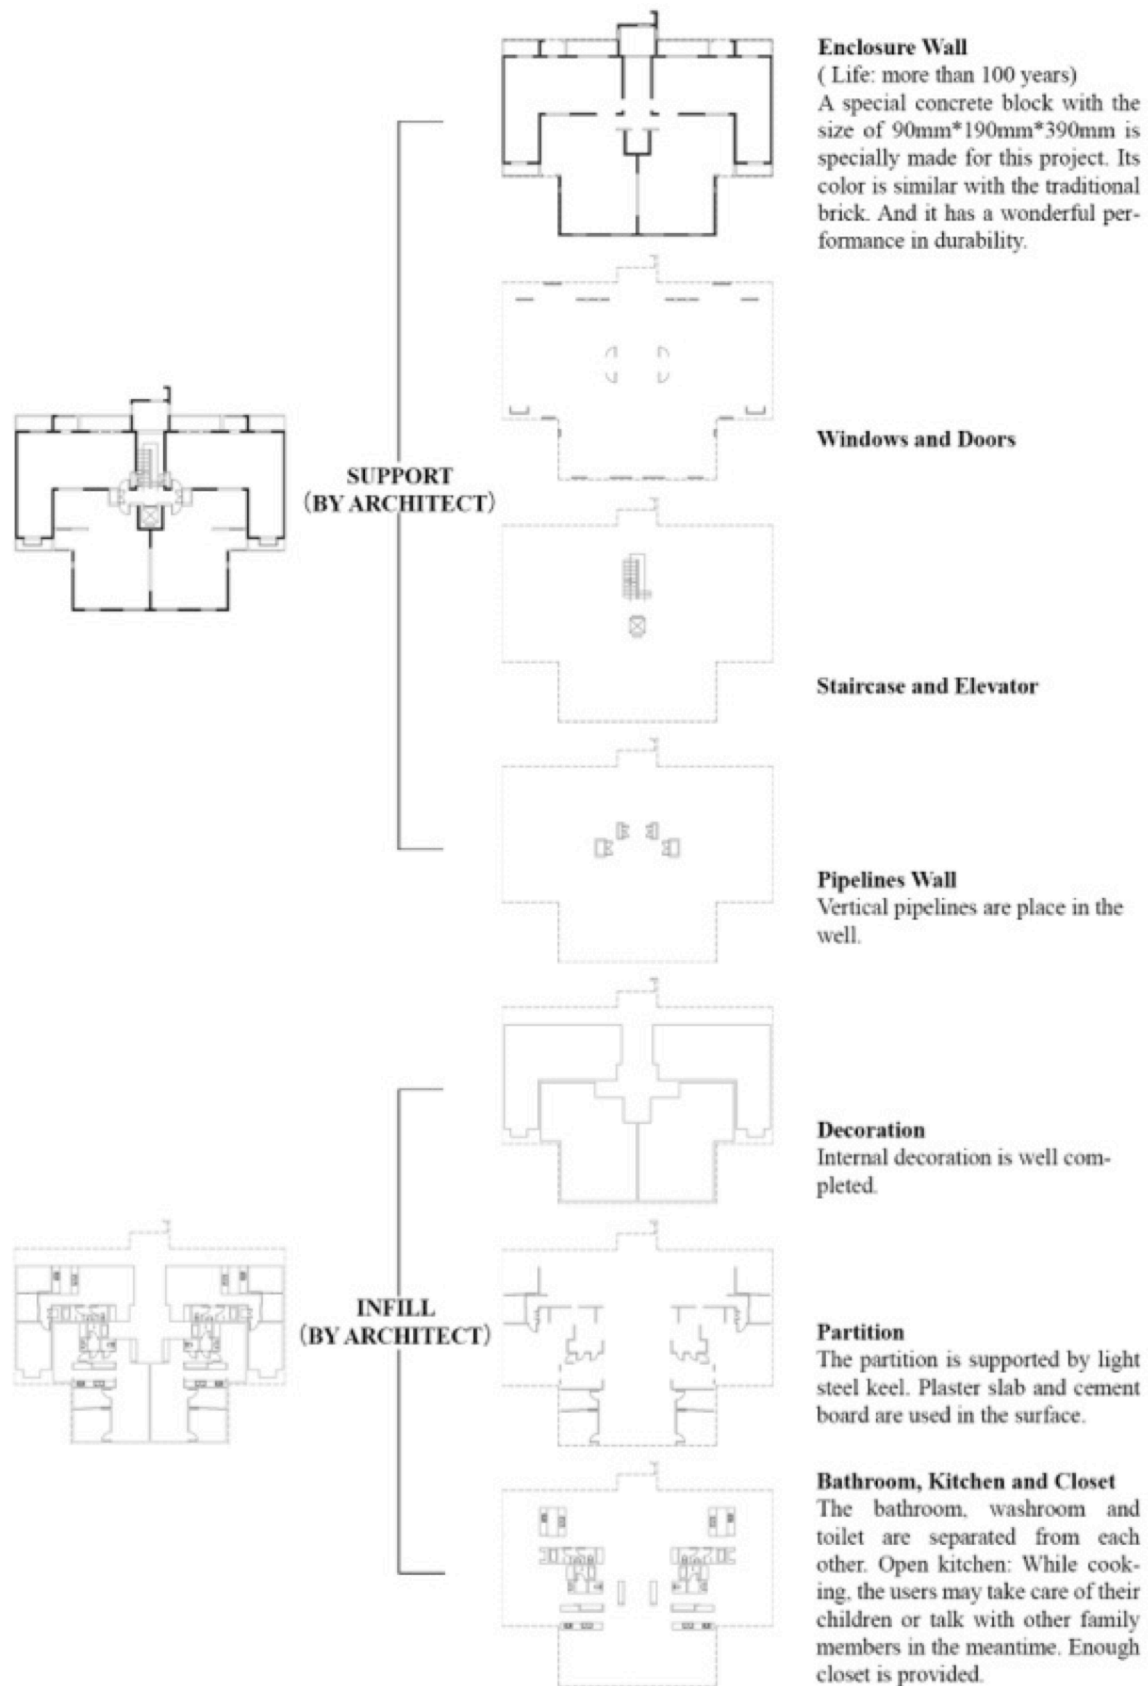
Layouts of typical units in Little Universe. (Source: by author.)
